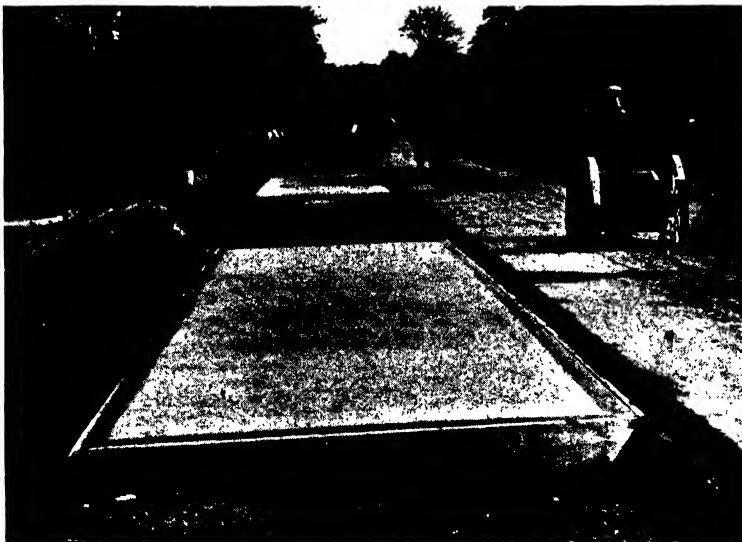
CONCRETE HAUNCHES UNDER CONSTRUCTION IN SURREY.
